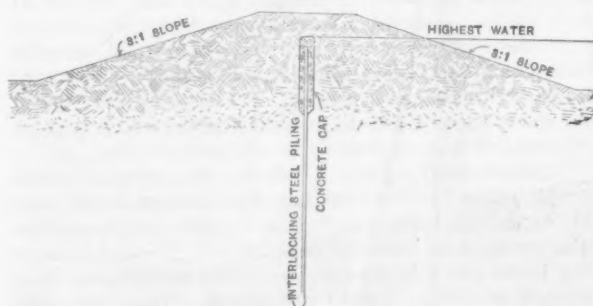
An Earth Levee with Sheet Piling Reinforcement.
